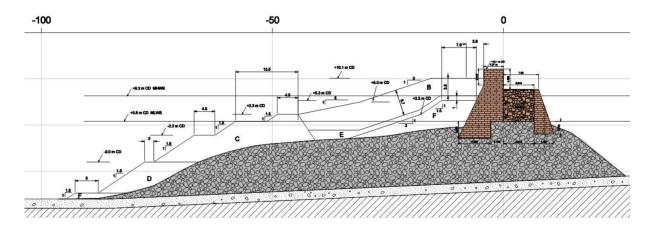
Cross section showing the existing breakwater (grey and brown) and the proposed upgraded breakwater
